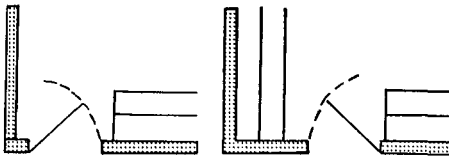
A door in a corner takes wall space which might be used for a cabinet.
